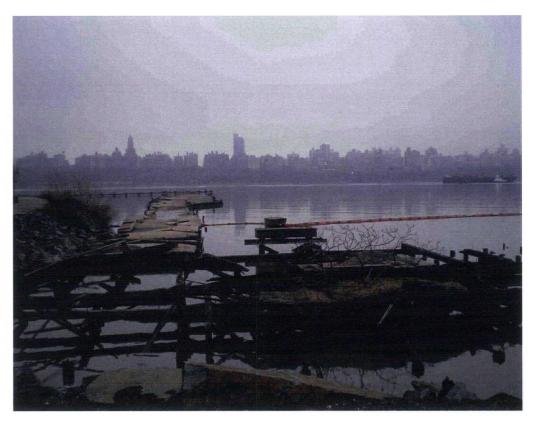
Pier located at northeast end of "The City Promenade" parking lot. Looking east.
